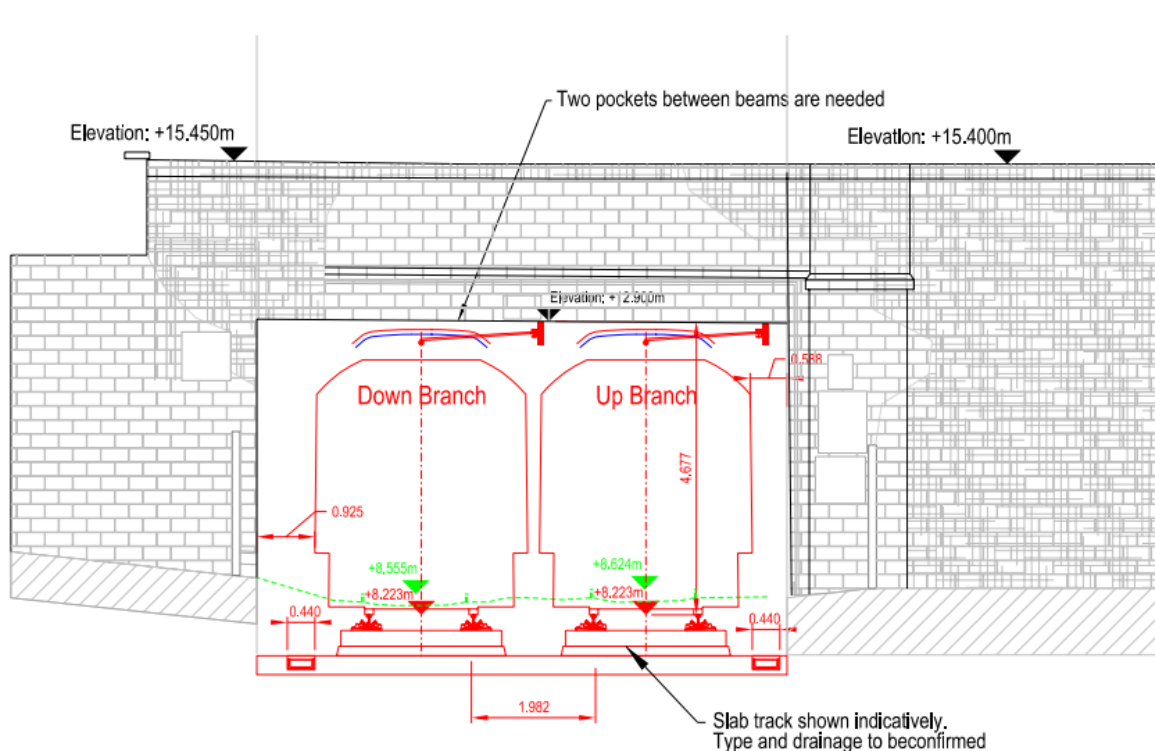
Conyngham Road Bridge (OBO2) – Cross section at Ch 8+771, view towards Heuston West
